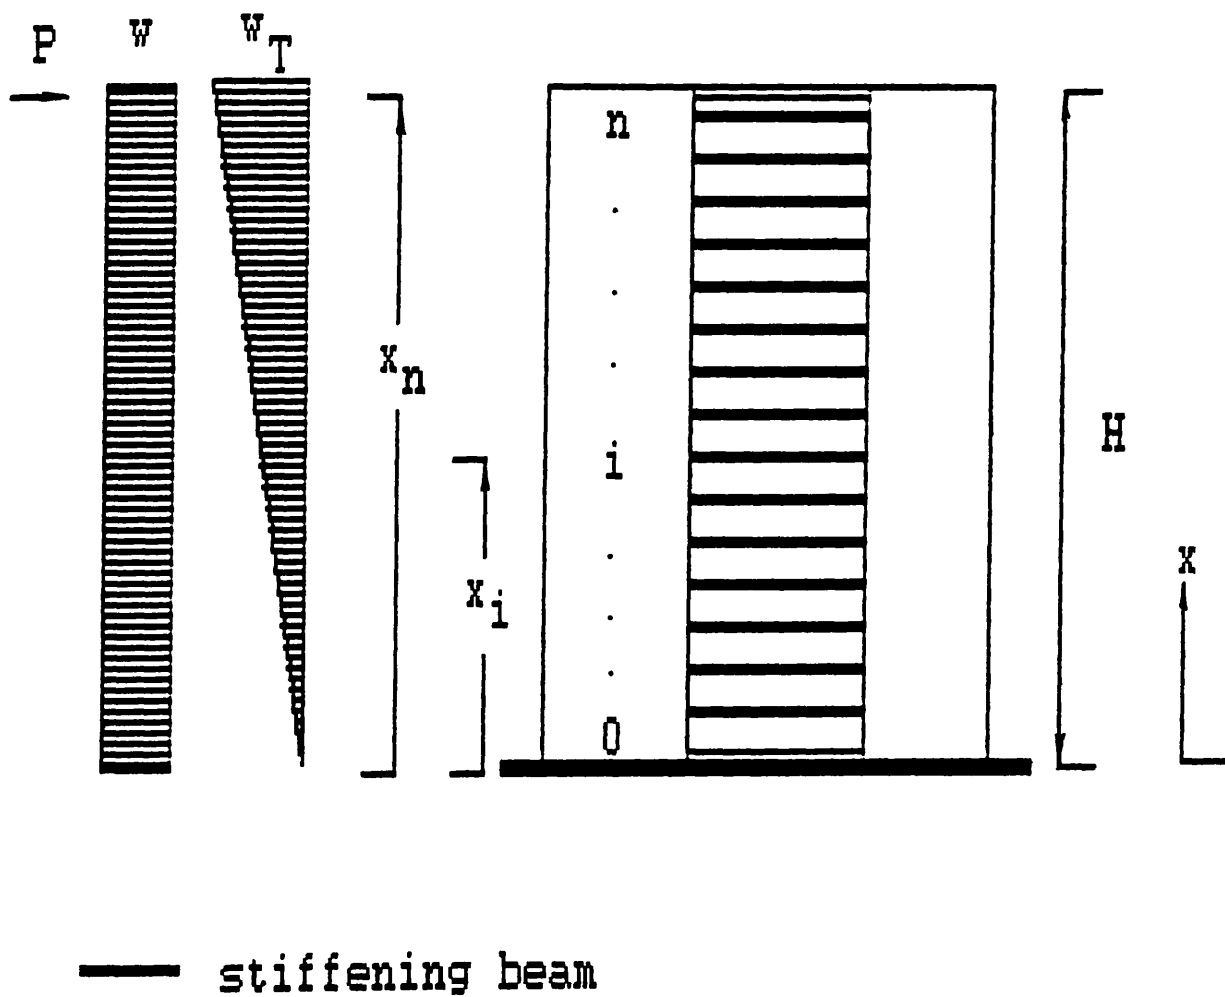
A LINKED SHEAR WALL STRUCTURE WITH n INTERMEDIATE STIFFENING BEAMS
